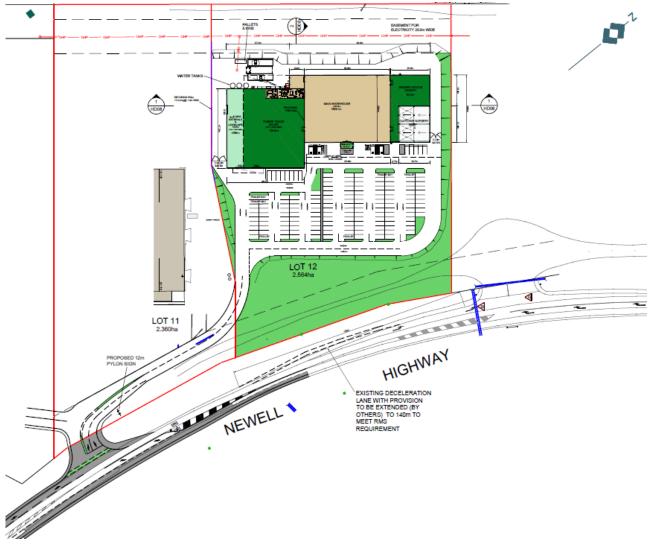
Original proposed Newell Highway access for Bunnings Narrabri
